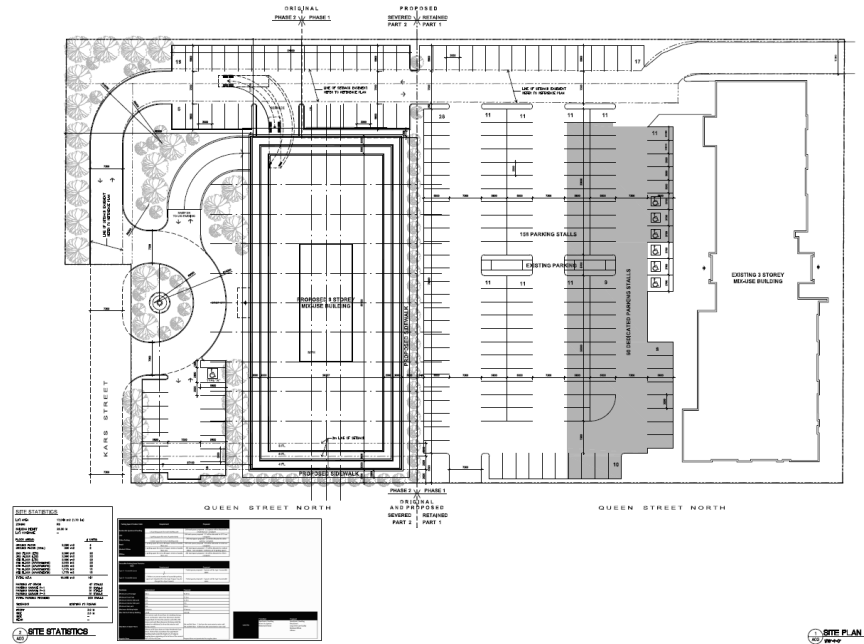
Subject lands showing the proposed 8-storey development and the 3-storey office building.
